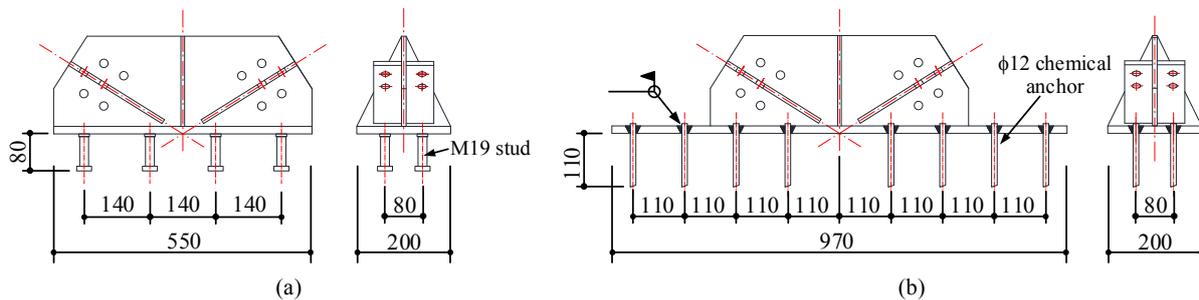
Connection details for gusset plates on beams: (a) embedded shear studs for new construction applications; (b) post-installed anchors for seismic retrofit applications.
